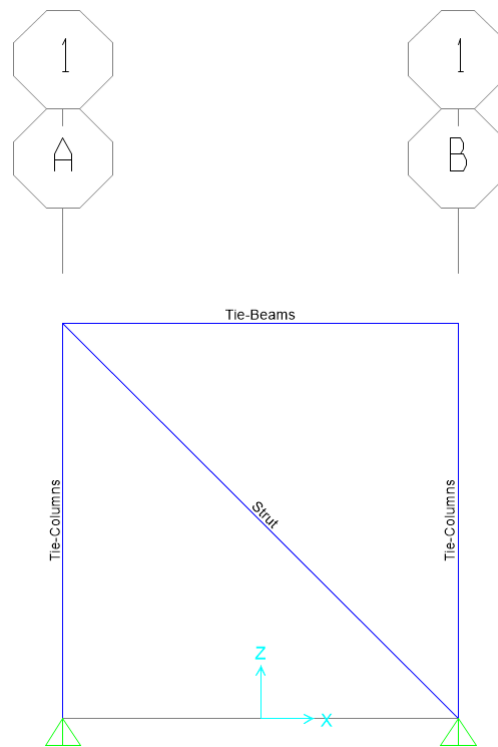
2D frame model configuration used for both masonry infill and confined masonry walls
